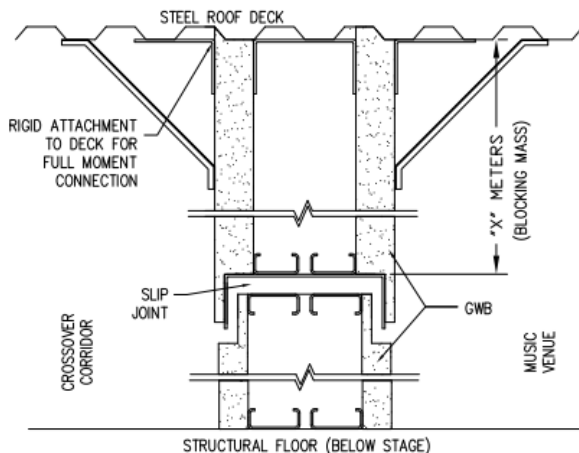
Proposed crossover corridor GWB partition with blocking mass suspended from the roof deck above.
